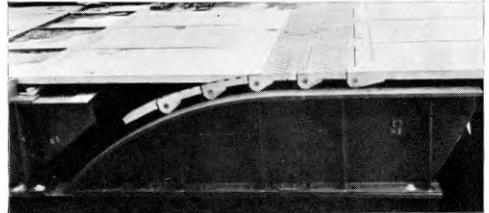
EXPANSION ARRANGEMENT USED AT MAIN TOWERS OF FORTH ROAD BRIDGE
